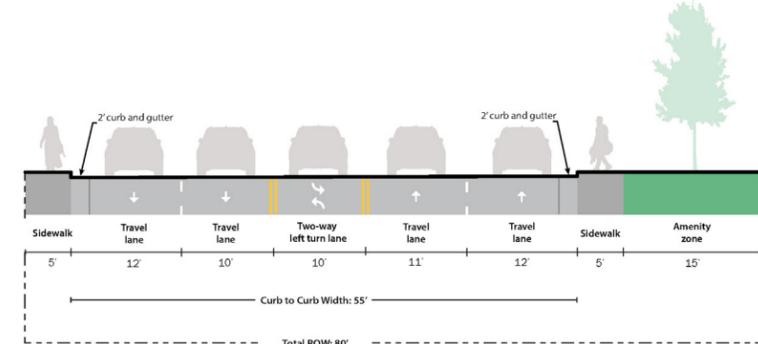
Section K (72nd Avenue West of Zuni Street – Looking East)
